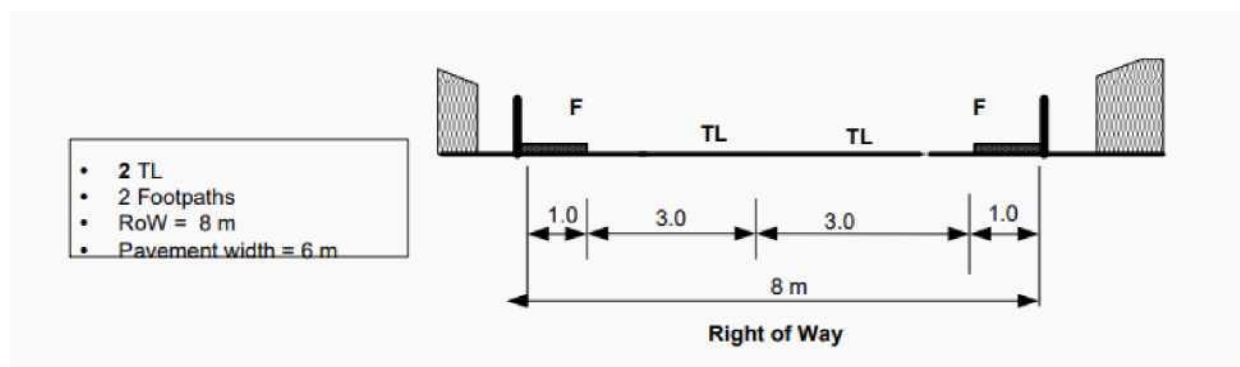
Typical Cross-section for Class C Roads (with RoW 8m)
